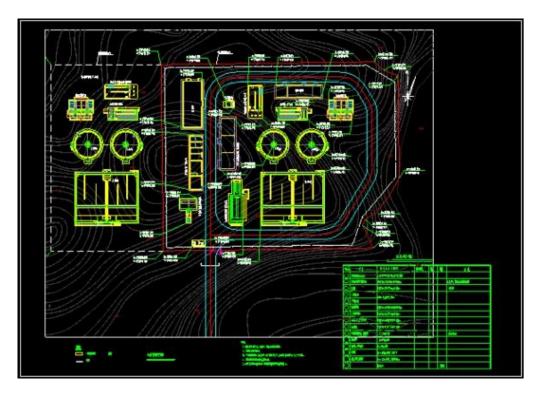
Lihuo-Tansan Group Wastewater Treatment Plant Plane Floor Design
